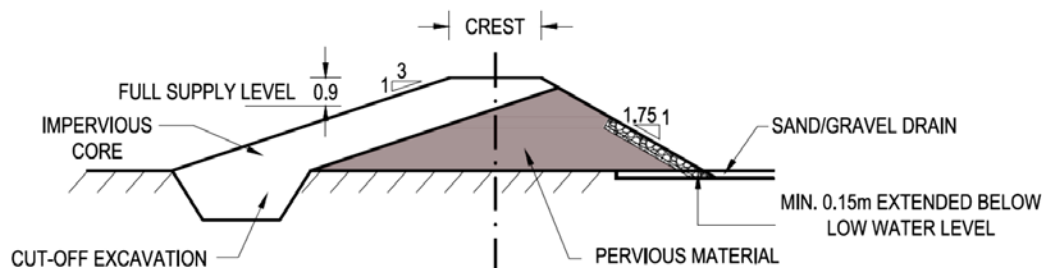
(c): Typical Cross-Section Diaphragm Dam
